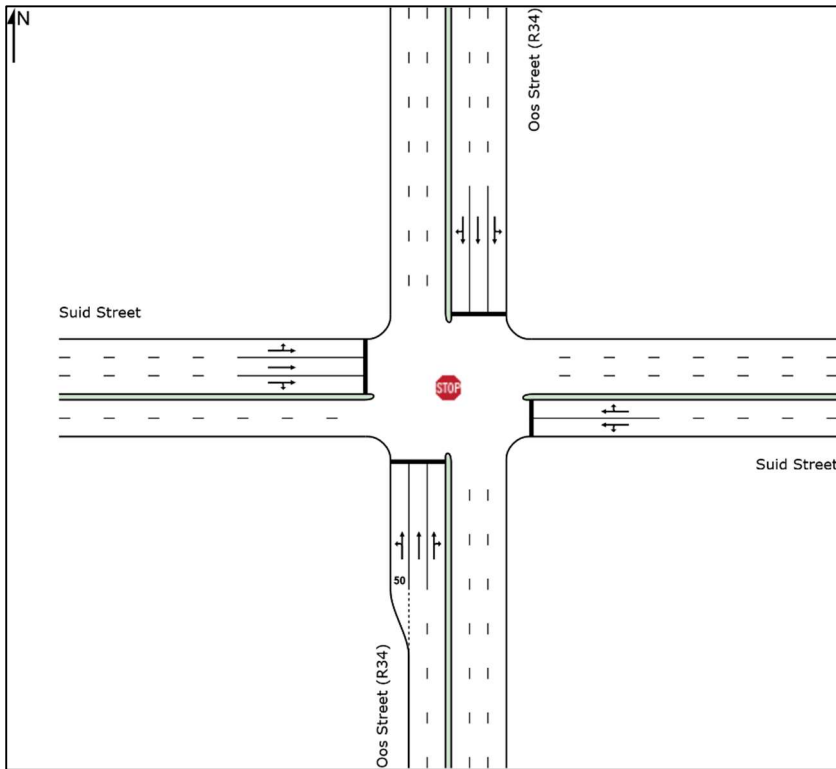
Oos Street (R34) and Suid Street - Existing Layout
